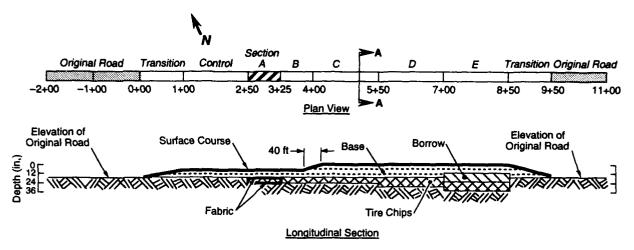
Plan and longitudinal views of test sections (cross section A-A is Fig. 3).
